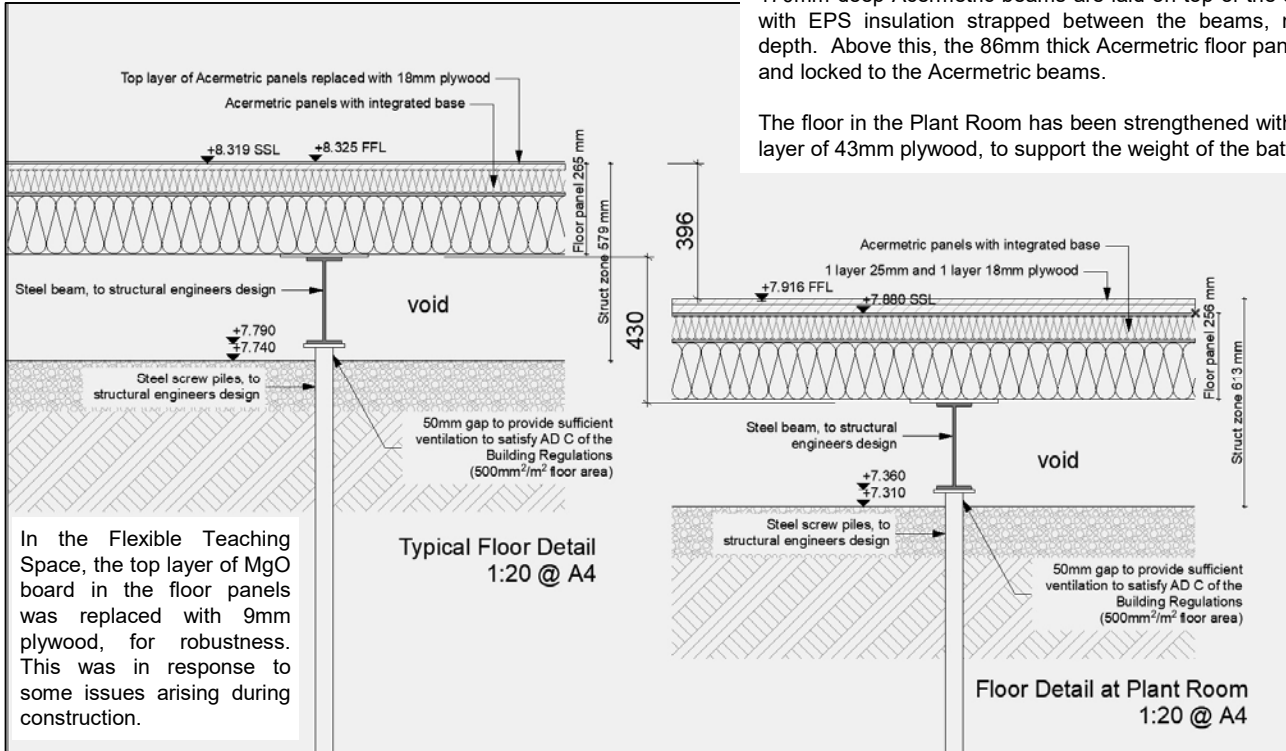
Cross section through floors of Flexible Teaching Space and Plant Room
